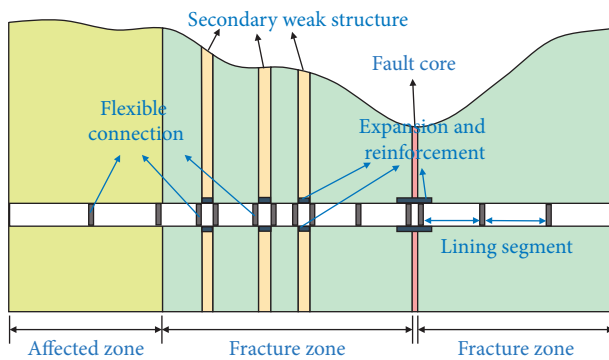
Engineering measures for tunnel crossing multilevel structural fault.
